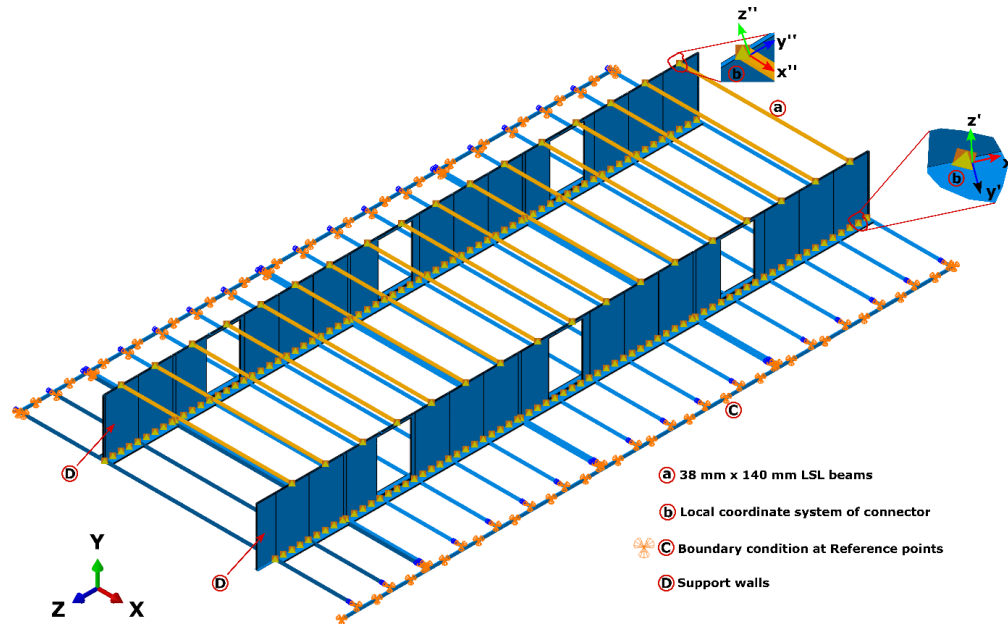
Support wall, LSL beam and Ceiling frame.
